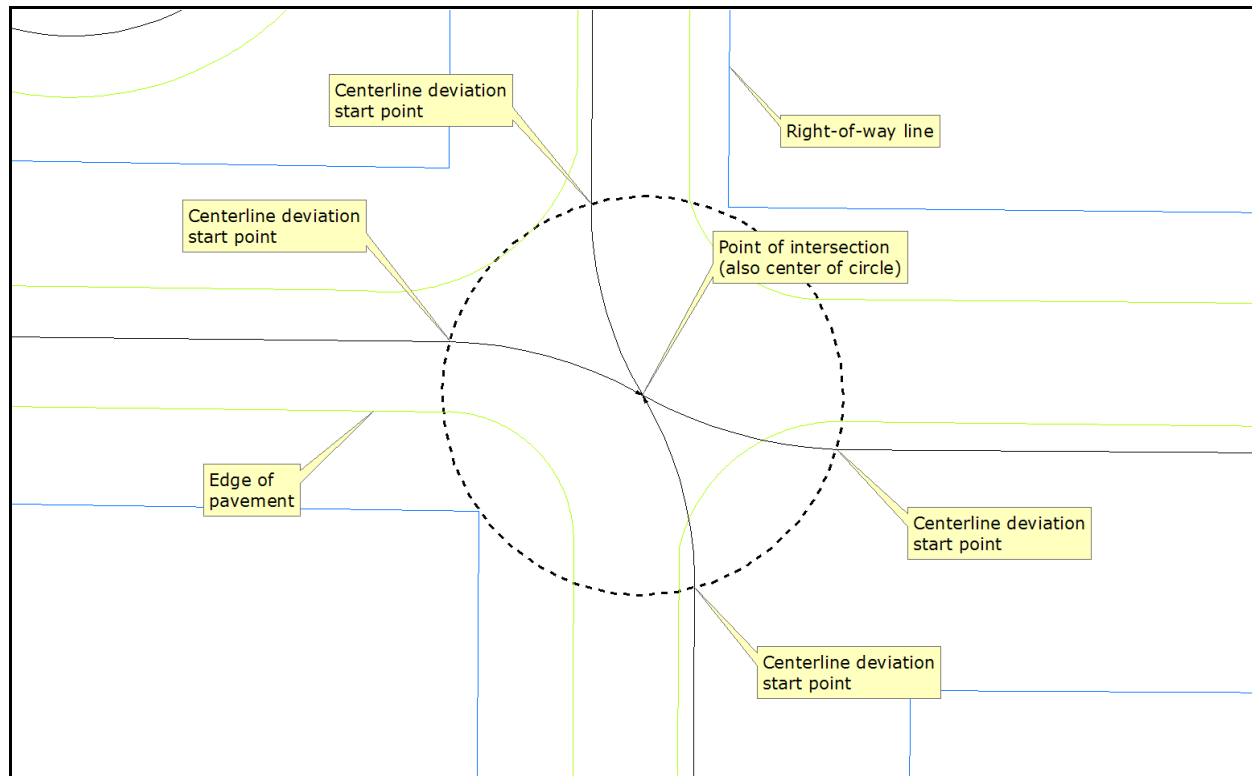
A double-offset intersection. Note that the centerlines are centered on the right-of-way, not the edge of pavement.
